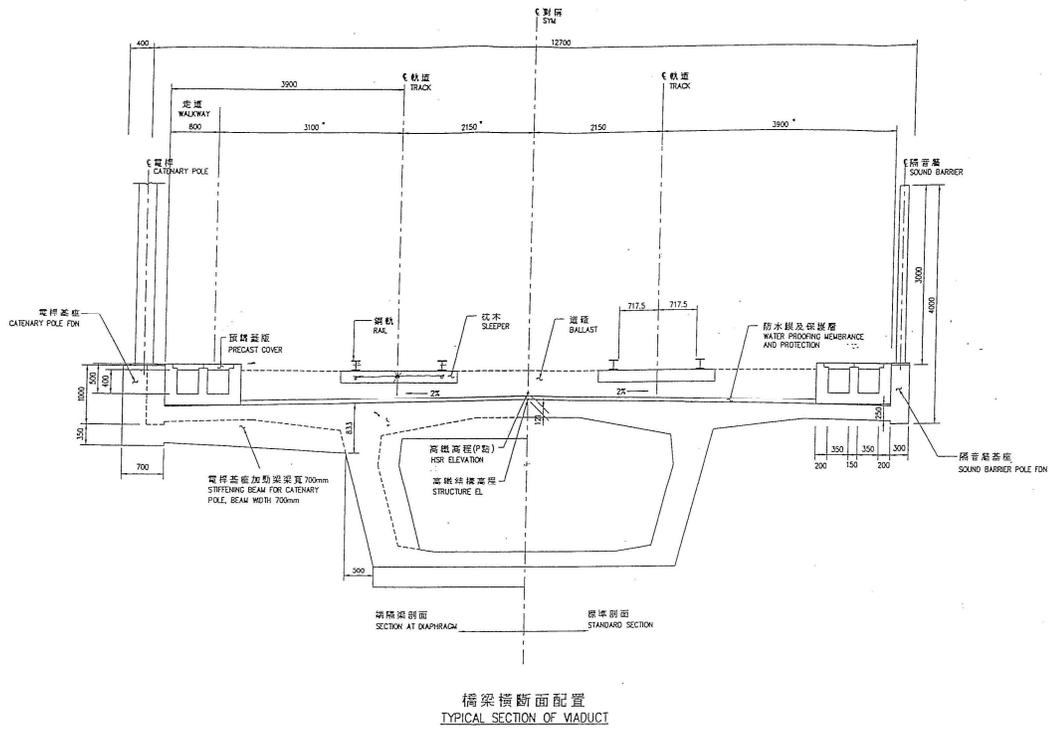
Section of Taiwan High-Speed Rail Viaduct
